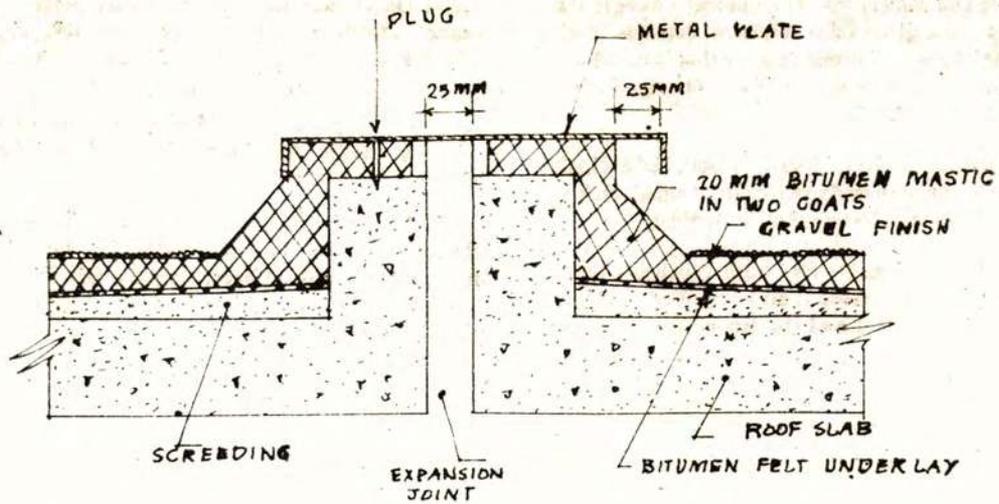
EXPANSION JOINT IN FLAT ROOF
